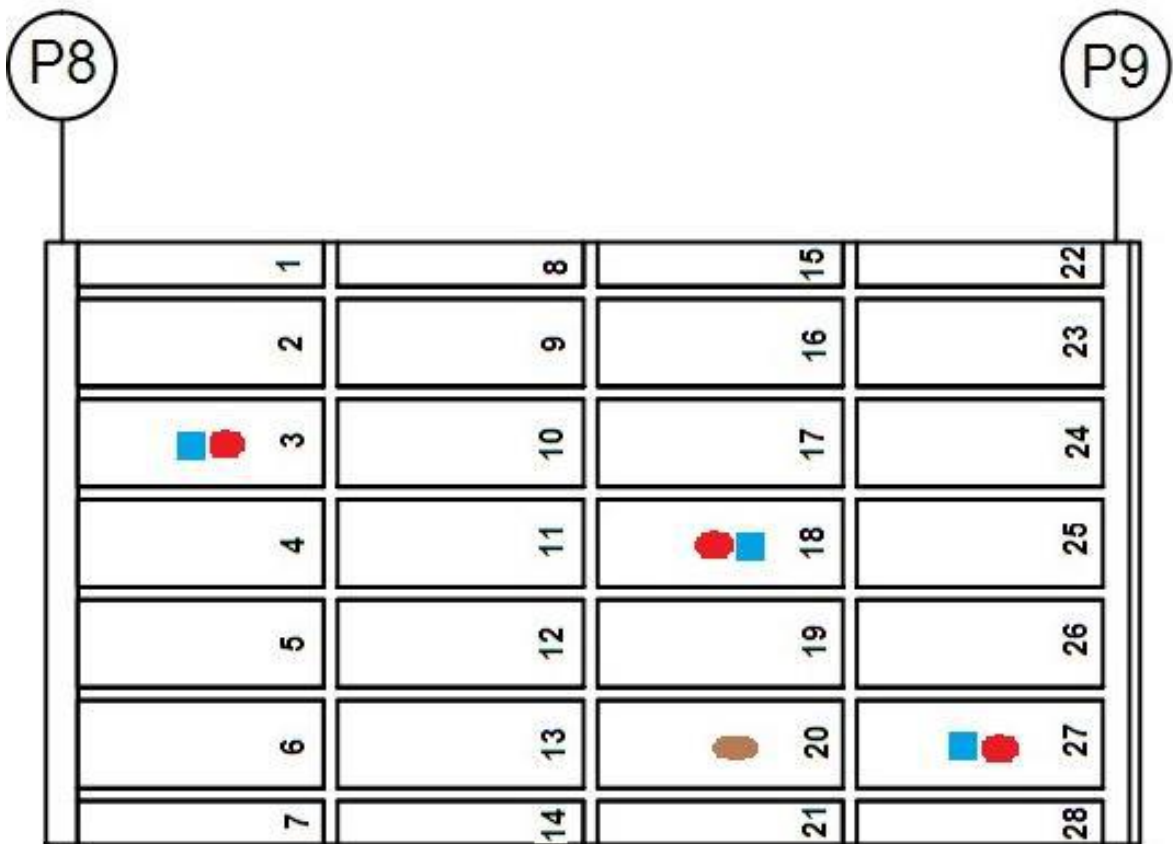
Test conducted at various locations between Pier P8 and Pier P9
